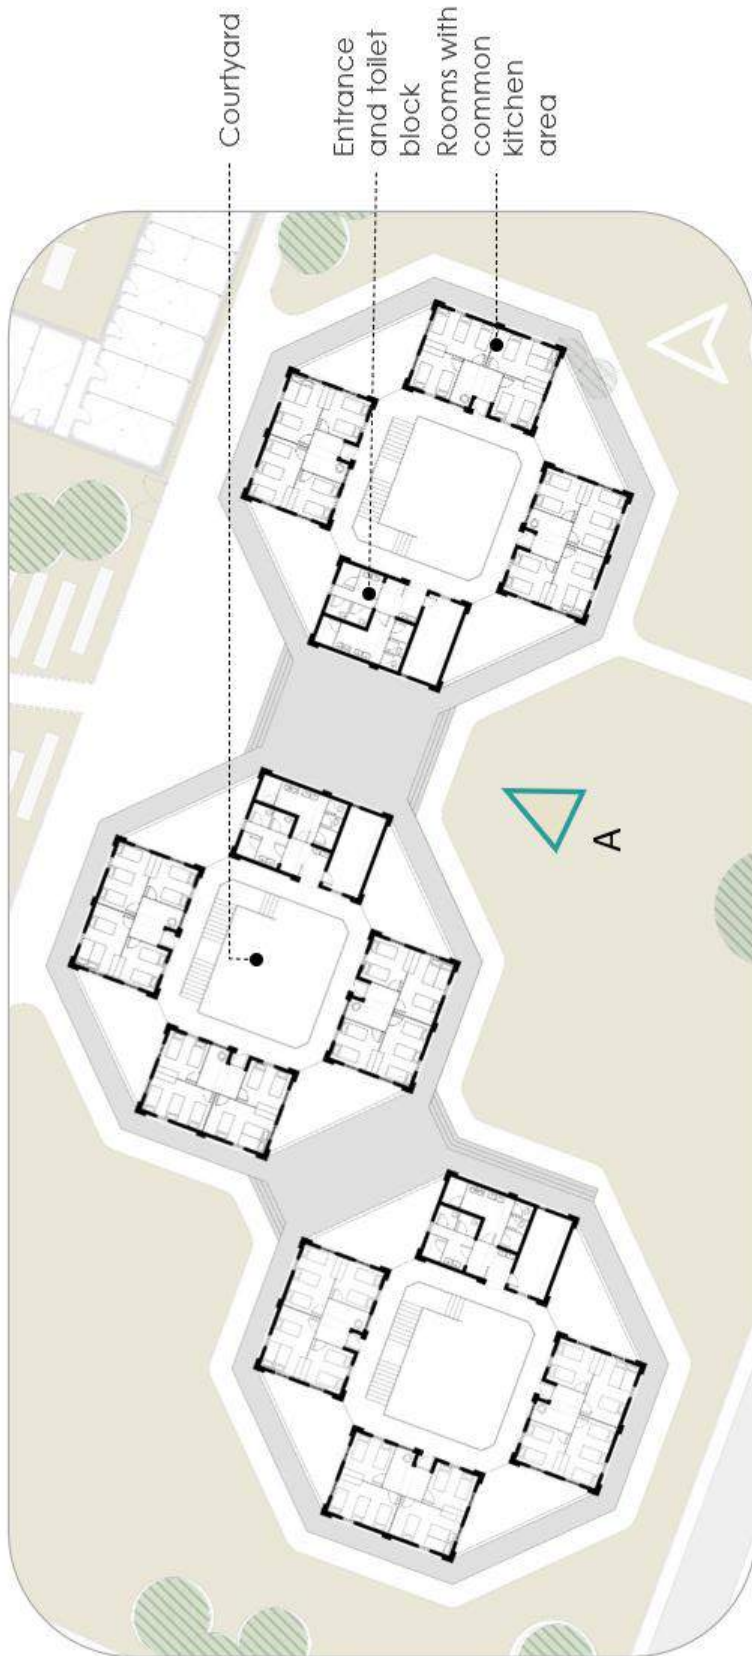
First Floor Plan of Mass Housing for Transient Fishermen (Source: Author)
